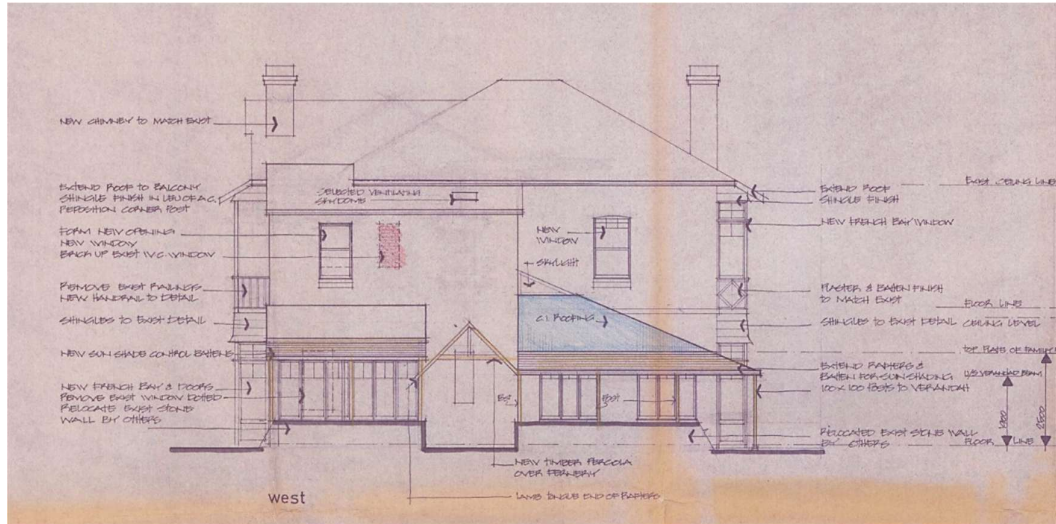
Approved plans 1983 plans for alterations and additions showing new French bay window at the western elevation.
